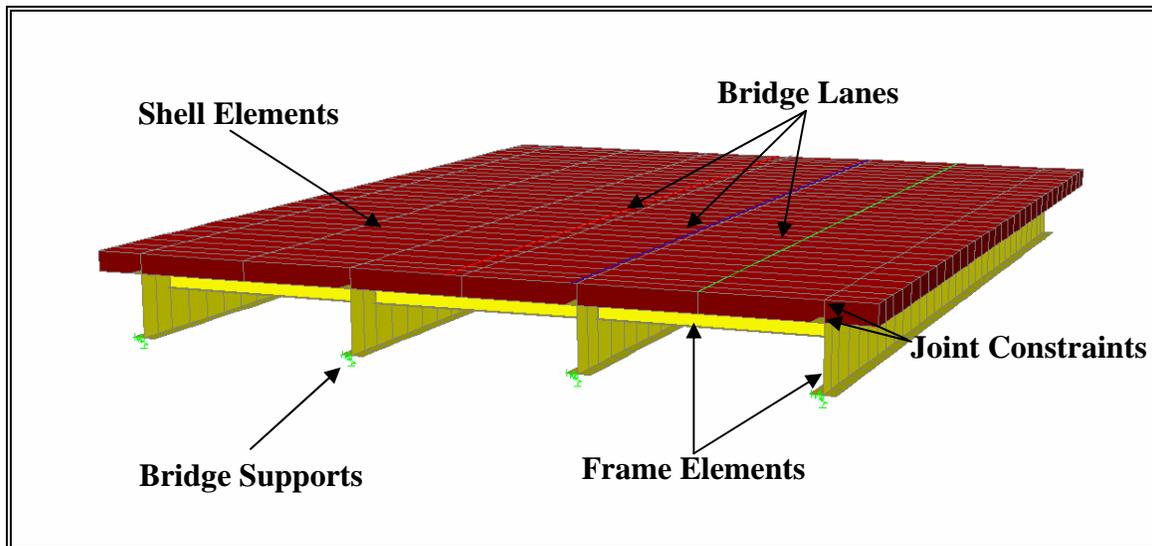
Finite Element Model of Multi-Beam Span
